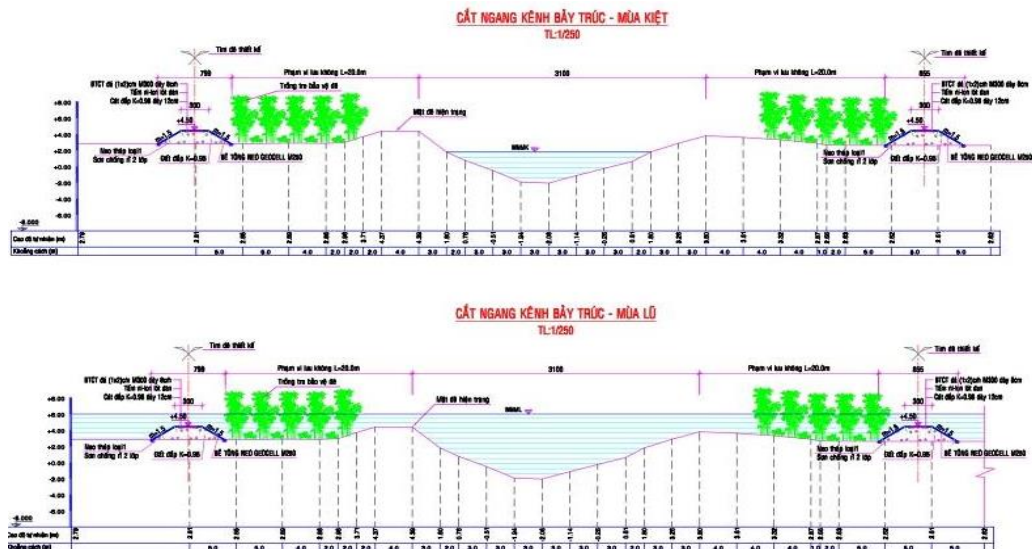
The typical cross section of dikes along Bay Truc canal, Vinh Loc canal and Vinh Hau canal
